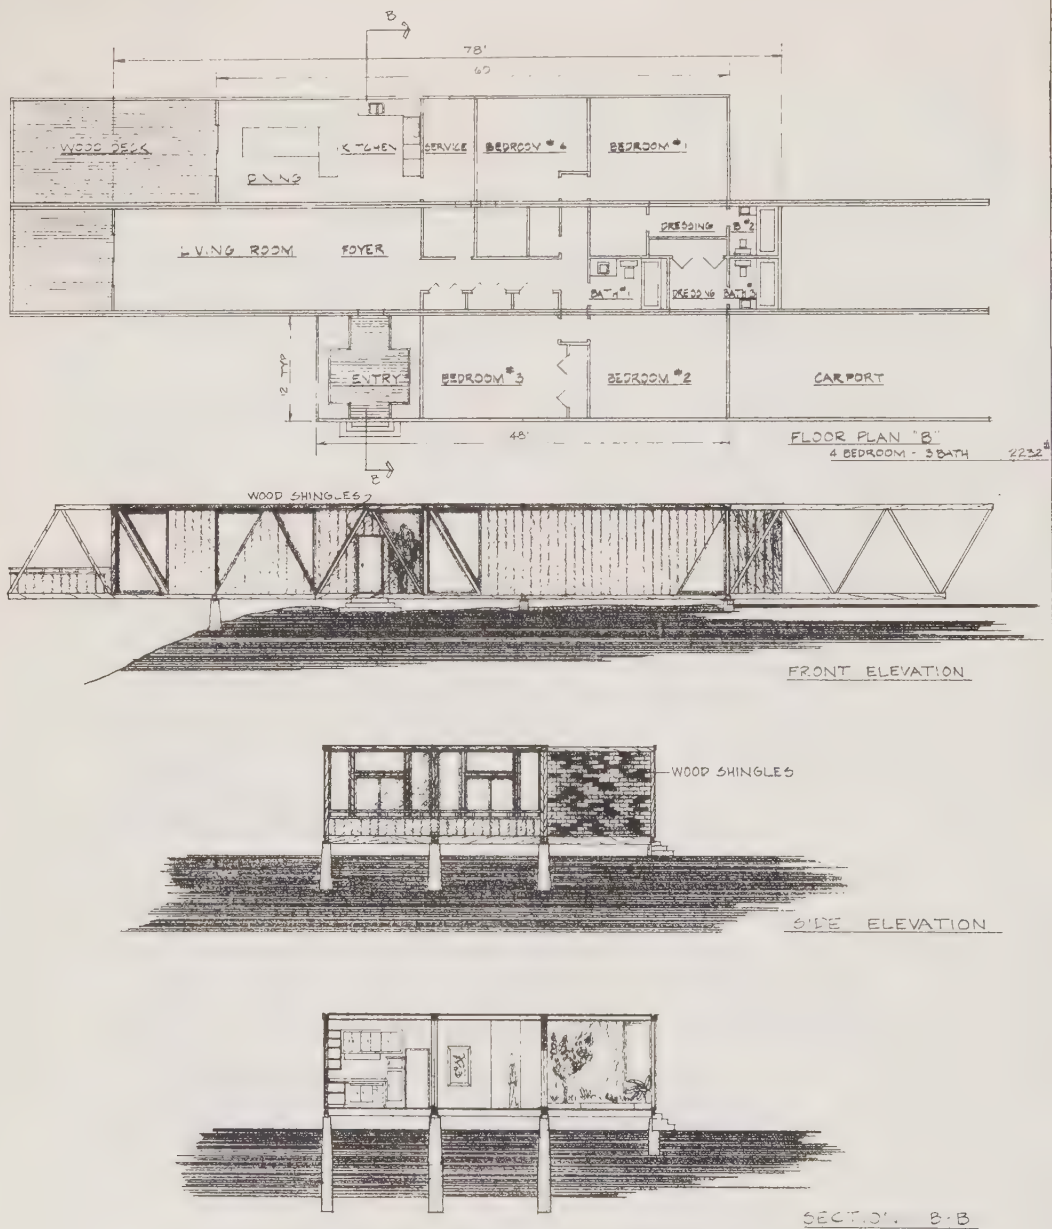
TRUSS-WALL FLOOR PLAN "B"
